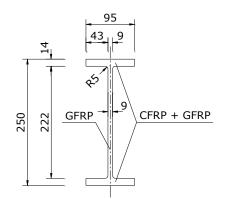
Dimensions of HFRP I-beams (unit: mm)
